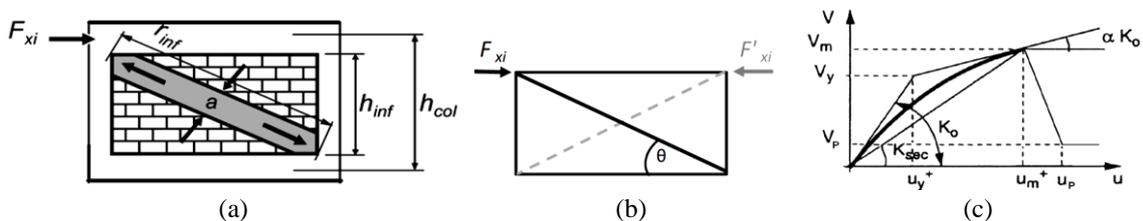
(a) equivalent compression-concentric strut model, (b) modeling of strut based on lateral load direction, (c) strength envelope for masonry infill panels based on constitutive model for masonry
